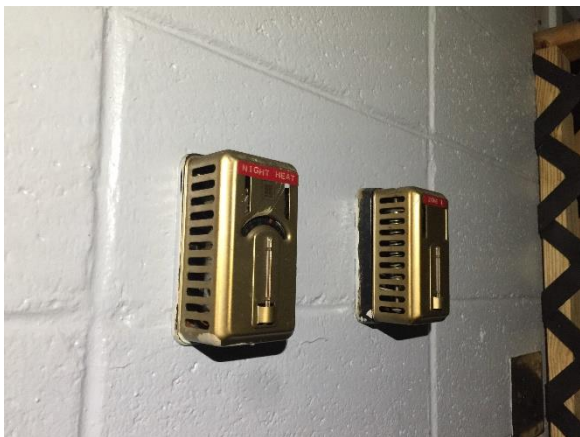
Example view of thermostats w/ mercury-containing thermometers in Warehouse #4 (Building 4).
